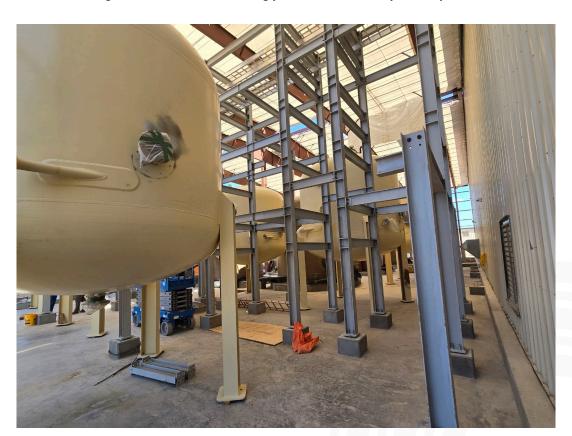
Ion exchange columns and pipe racks placed in new section of plant
